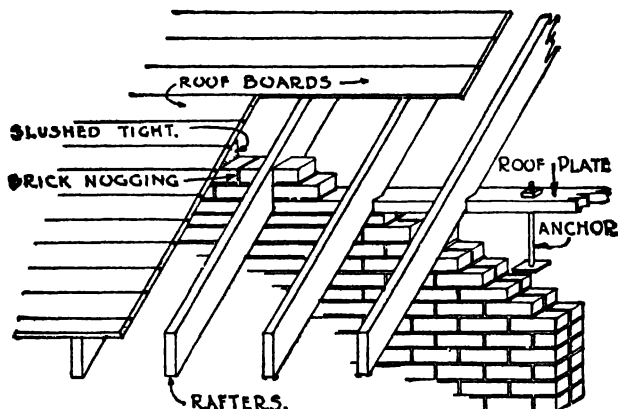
,353.—Method of anchoring roof plate showing rafters and roof boards in place.
